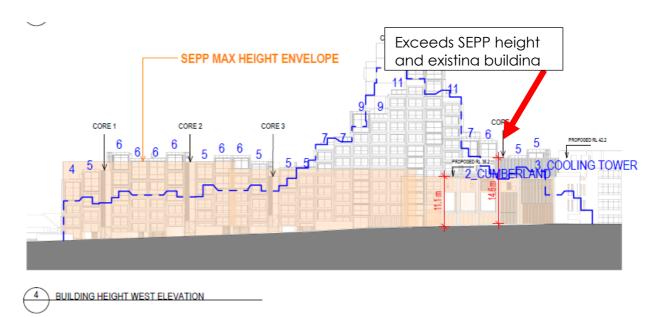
Height exceedance above existing envelope (southern part of the site adjoining 88 Cumberland Street)
